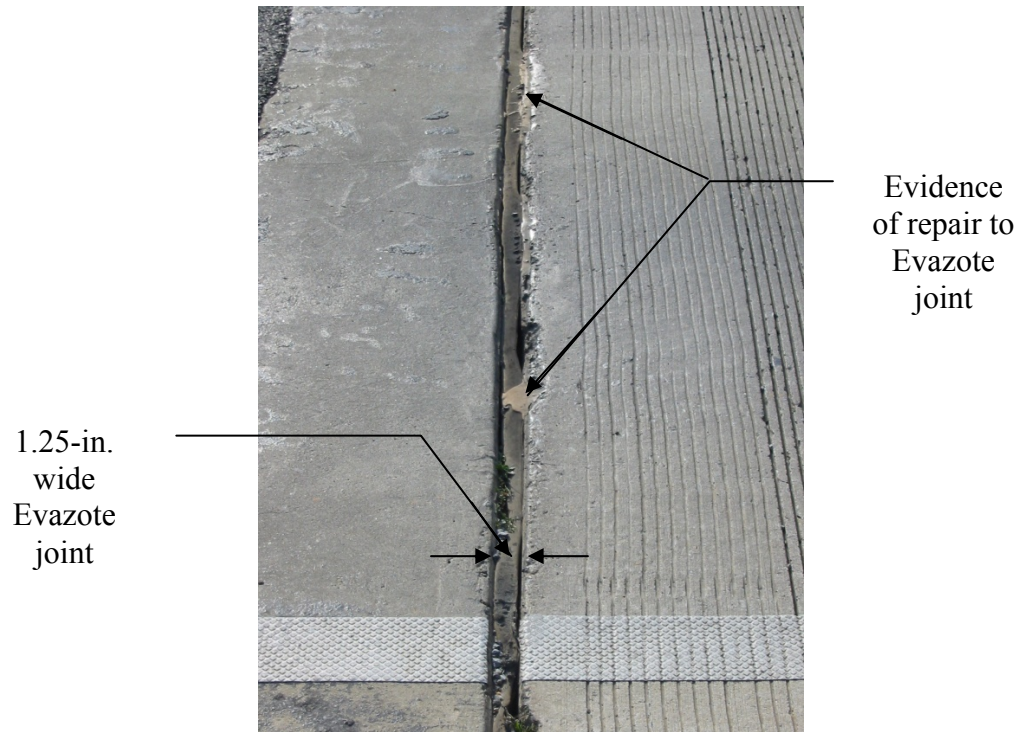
Improperly installed Evazote joint pulling away from the bridge deck with evidence of repair (bridge supporting GA SR 113 Over Dry Creek)
